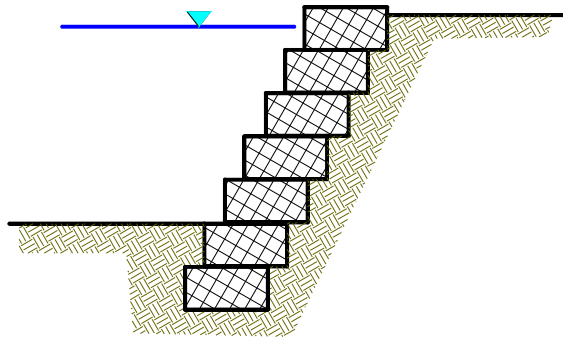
Grouted Riprap, Wall Type
